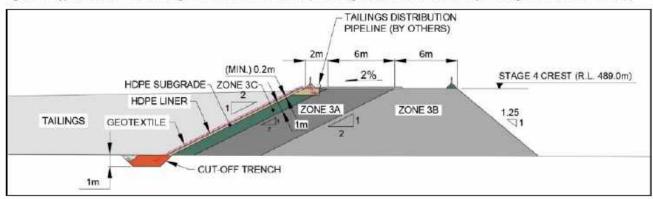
Typical Section IWLTSF Stage 4 Embankment Extension (Extending Across Natural Ground Beyond Stage 2 and 3 Embankments)
